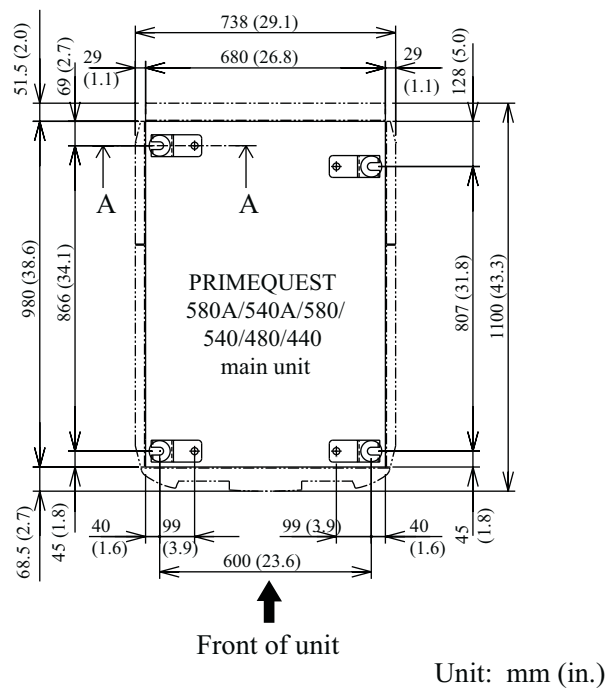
Example of installing a PRIMEQUEST 580A/540A/580/540/480/440 system by using the earthquake-proofing construction method
